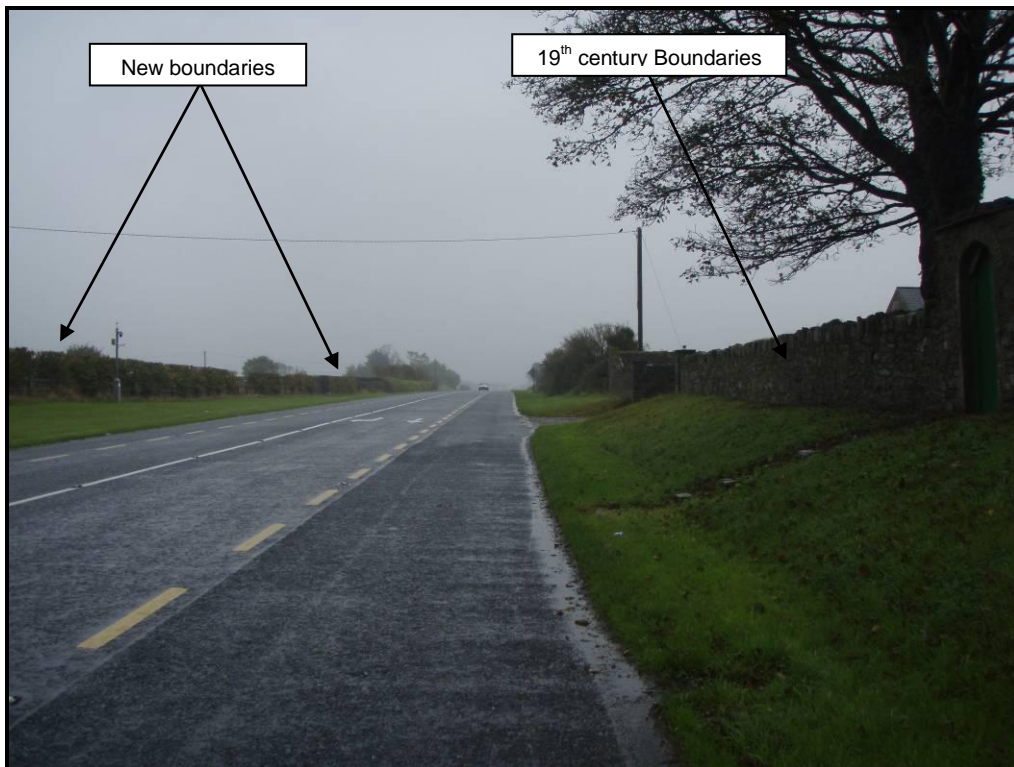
View of the N25 Dungarvan Bypass Youghal Road section, looking north. Note how the road has been widened and the level lowered. The pipeline will be laid in the south bound road verge / hard shoulder.
